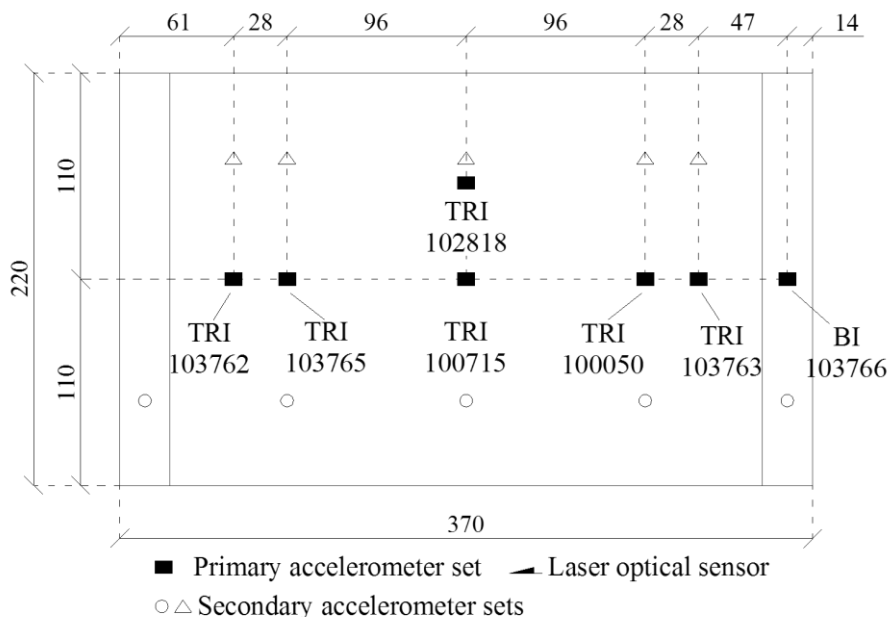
Instrumentation layout: plan view (dimensions in cm)
